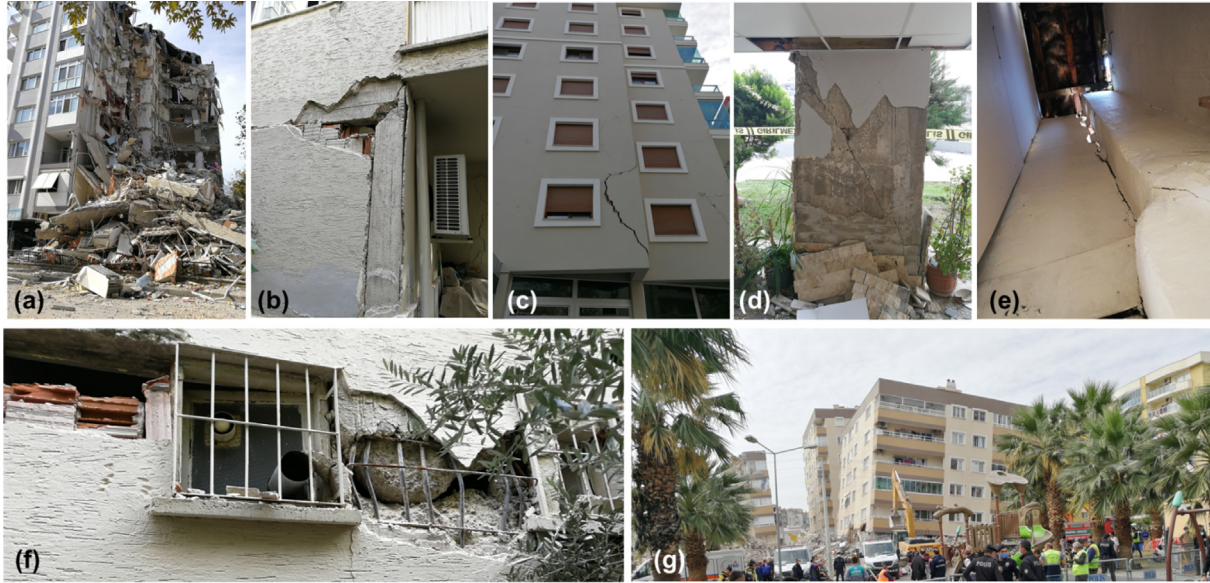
(a) Partially collapsed building in Manavkuyu District (heavy damage) (b) Failure of the beam-column joint (moderate damage) (c) Formation of cracks (moderate damage) (d) Damage due to soft story effects in Karşıyaka (heavy damage) (e) Relative movements in a masonry building in Konak District (heavy damage) (f) Short column formation (moderate damage) (g) Building with first floor collapse (heavy damage).
